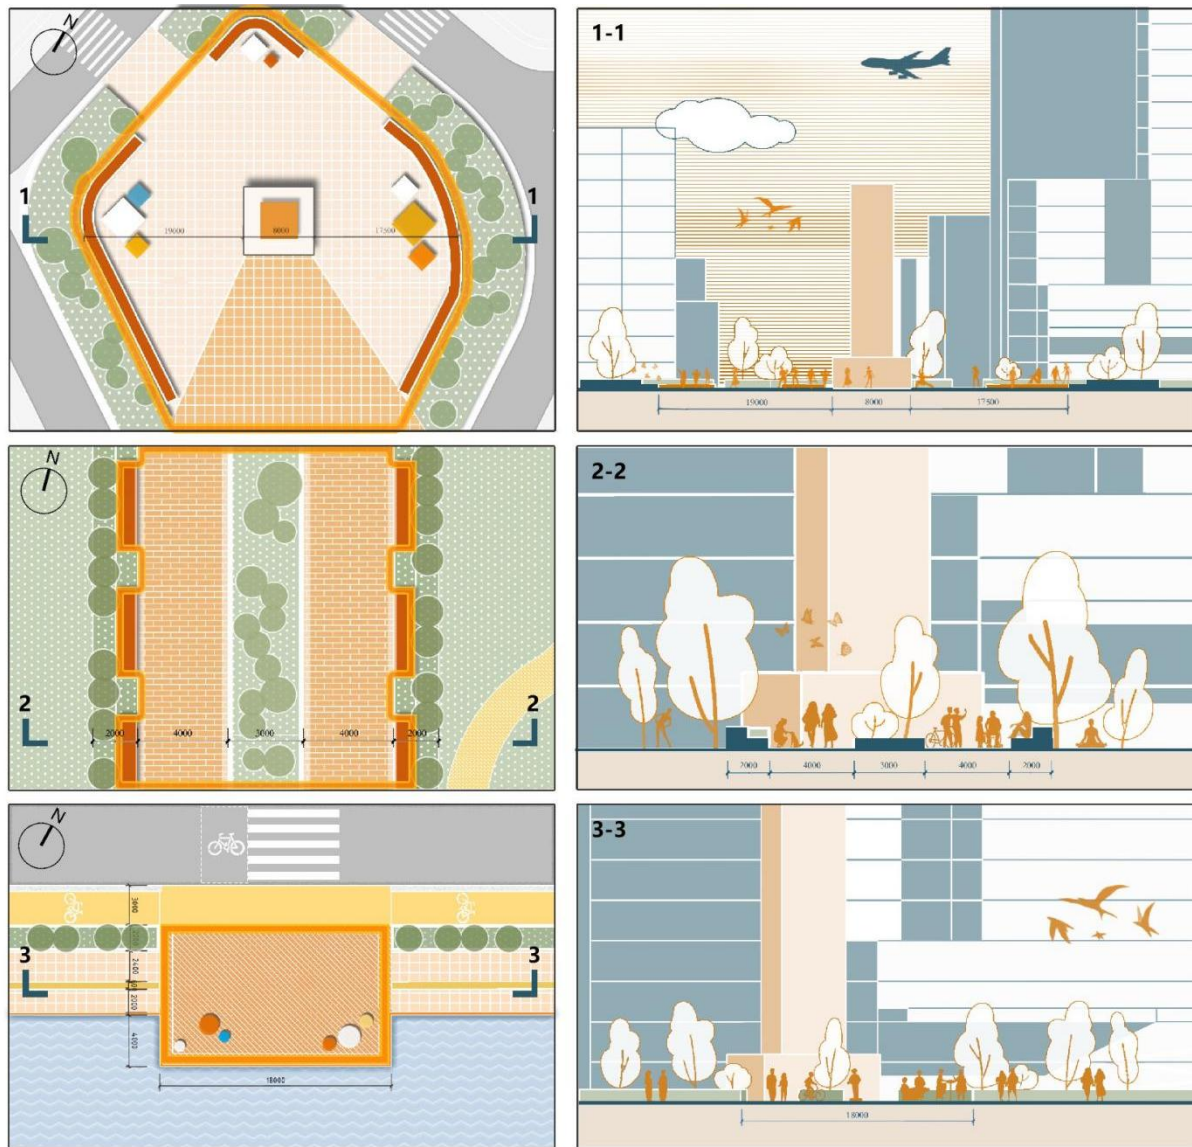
Plan and section of three key points (Source: Completed by author)
